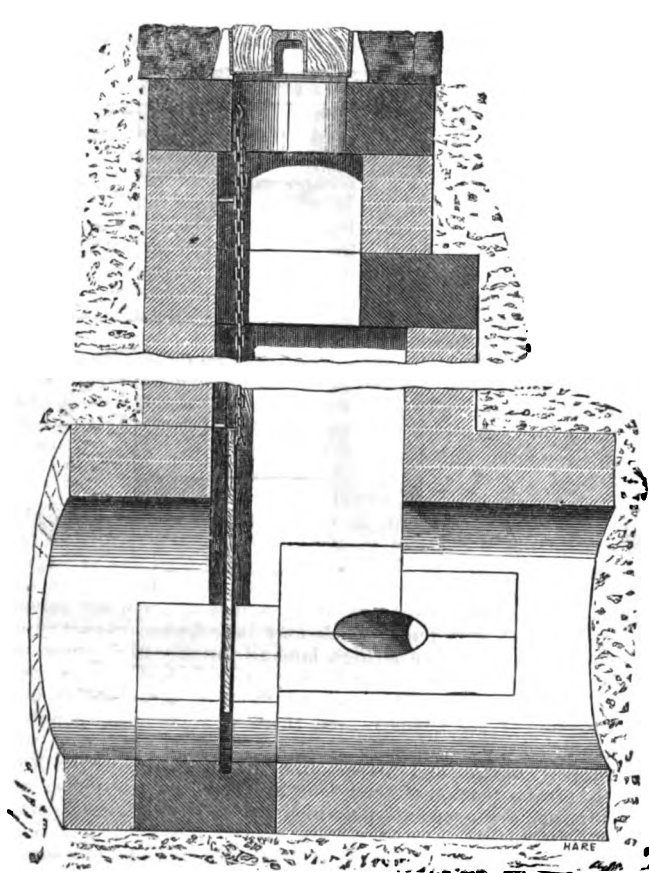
Manhole and Flushing Chamber, with Junctions on Brick Sewer. Section on the line A A, of Plan, Fig. 6.
